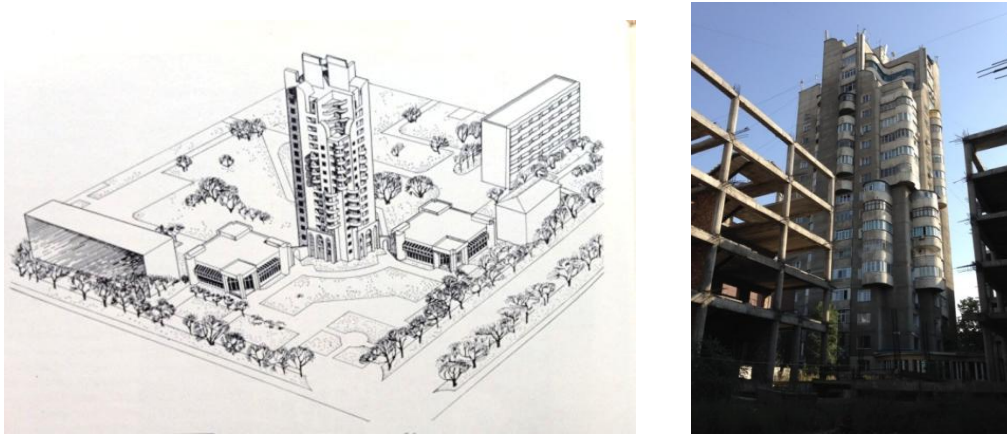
18-storey residential building on Soviet-Kiev street intersection.
